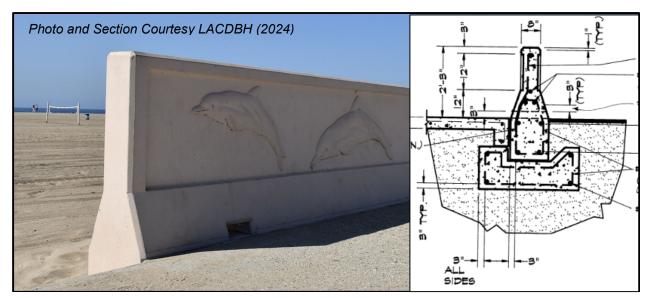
Photo and Cross Section of Low Sand Barrier at Zuma Beach
